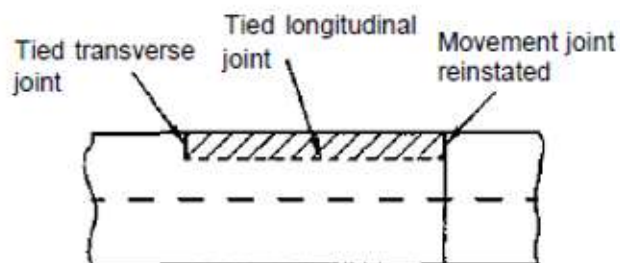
/14- 5 Longitudinal section through transverse full-depth repair adjacent to an existing transverse movement joint in URC pavement (taken from Figure 8.6 of Concrete Pavement Maintenance Manual, 2001)
